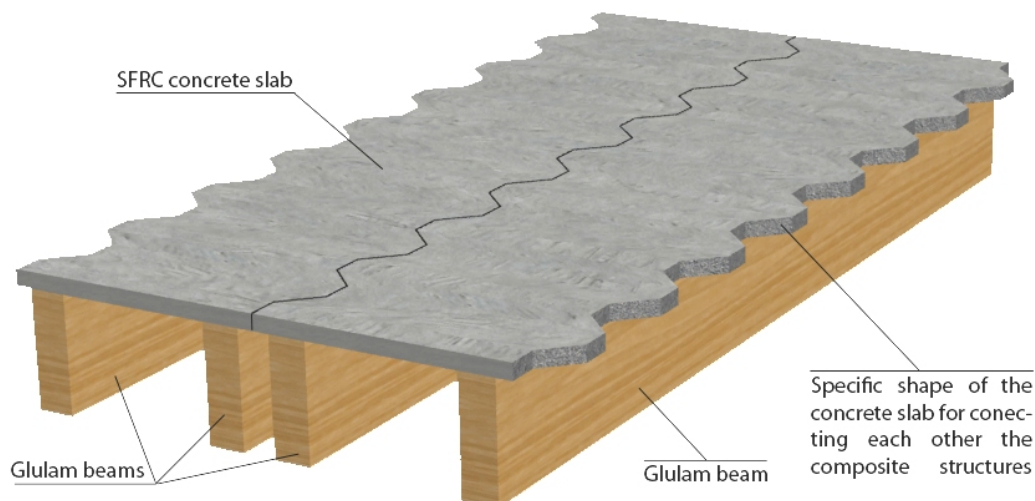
Possible interconnection between composite floors for full-prefabricated system.
